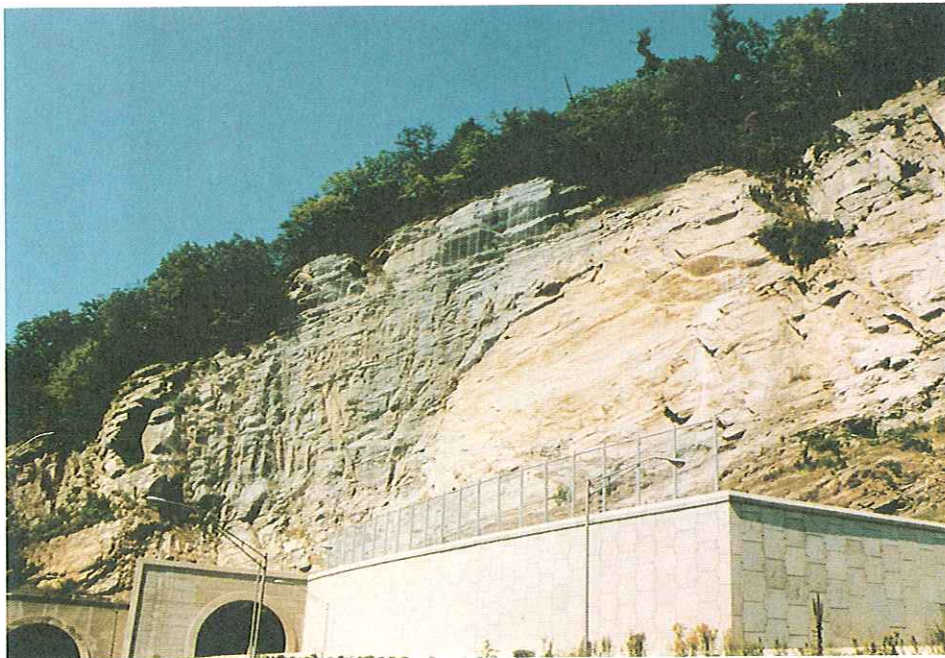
Double concrete tunnels. The portals extend well out from the face. A rock catchment area has been extended below the rock slope beyond the tunnel by use of a retaining wall (Courtesy North Carolina Department of Transportation).
